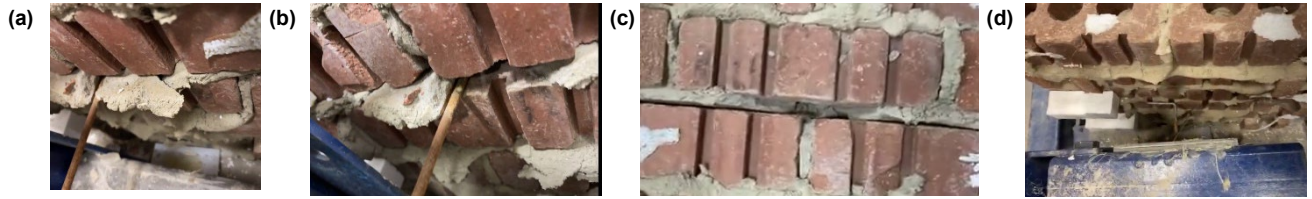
T-Z.CL-1 after testing (a) top view, (b) alternative top view, (c) mortar joint condition, (d) elevated view of specimen
